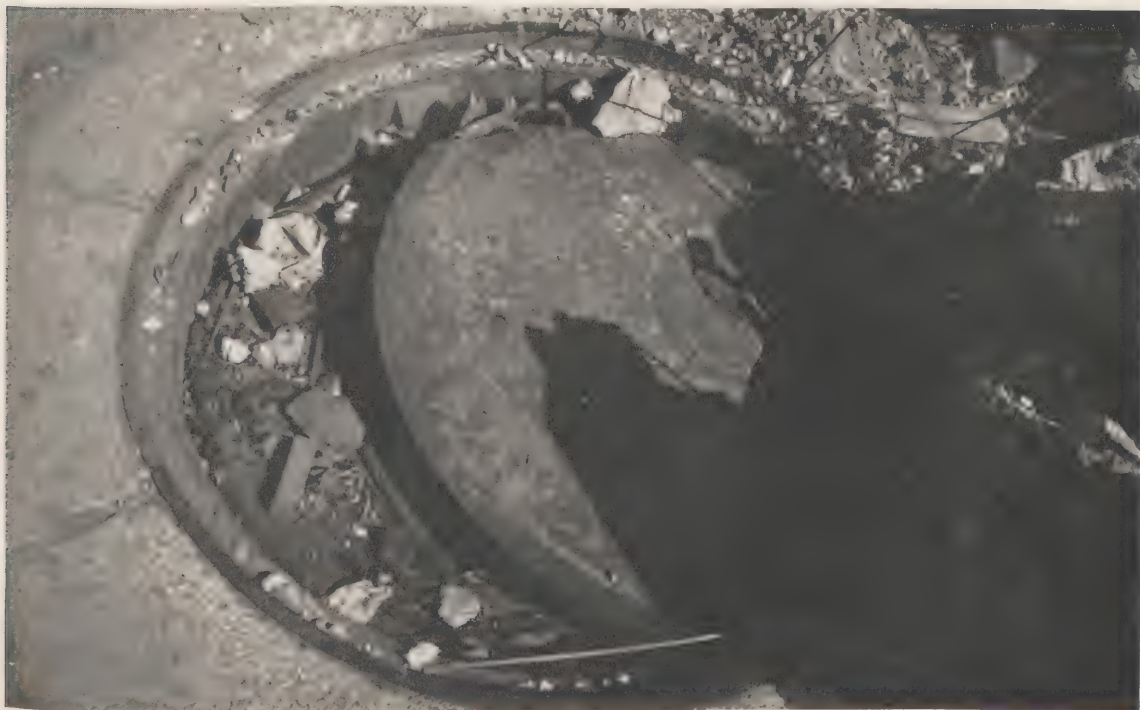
XIII. Debris-damaged telephone manhole cover 100 feet from GZ. Secondary cover undamaged.
